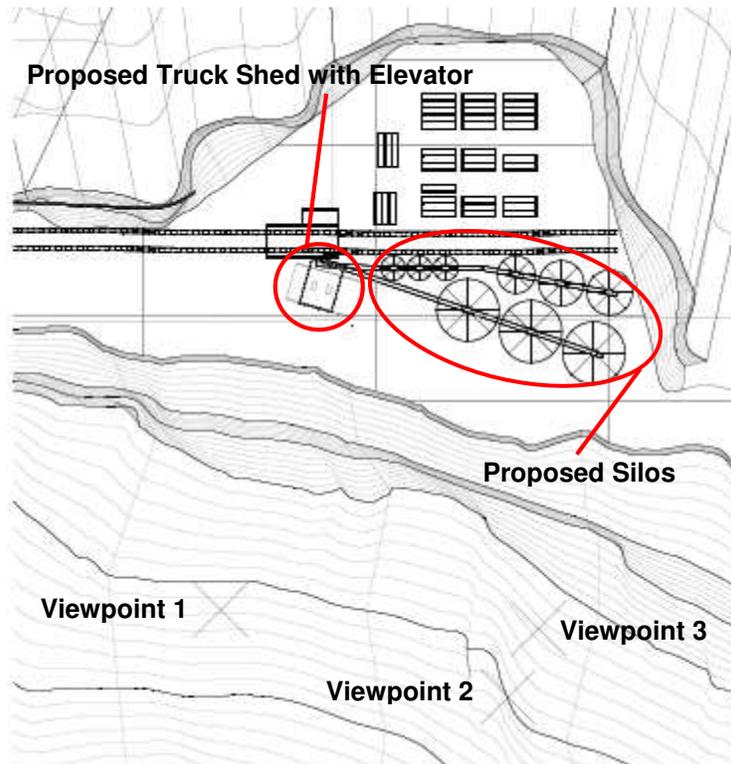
Aerial view of the camera viewpoints near Dusty Greenwell Park, landscape contours and plan view of the proposed Columbia Container site (truck shed with elevator tower, and silos) (Nu Westech Engineering Ltd, 2014)
